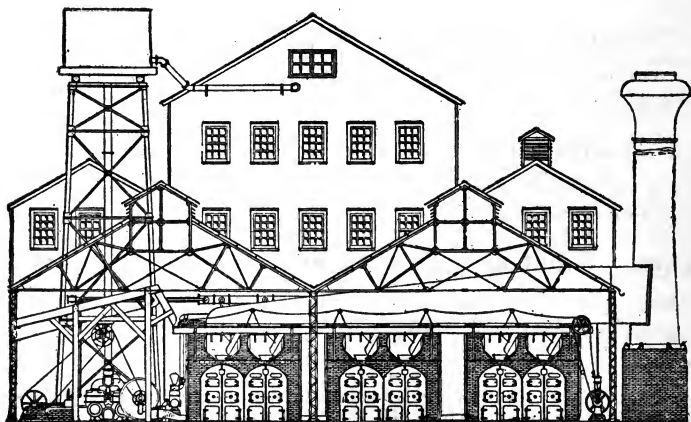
,654.—Arrangement of bagasse burners with Sturtevant fan at Incognito Plantation, La.
